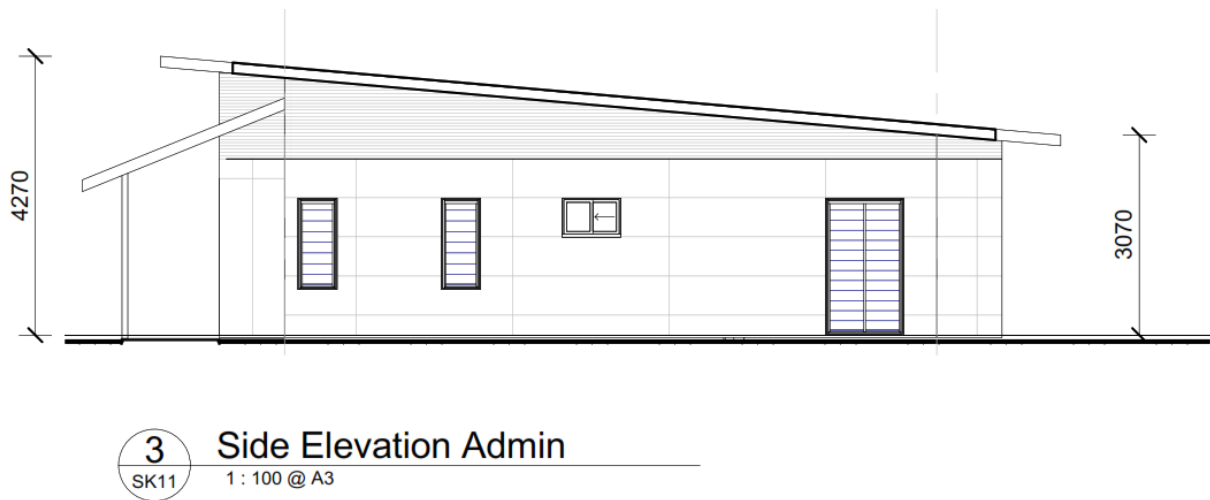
Side Elevation of Administration Building (Source: BAU Design Architects, 2021)
